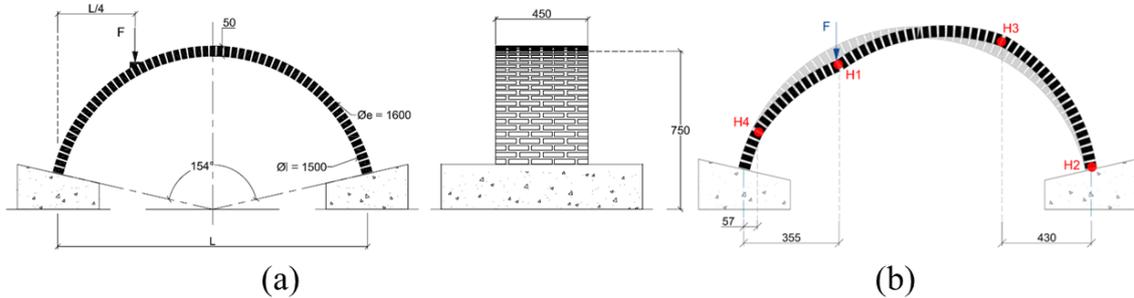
Unreinforced masonry arch (Basilio, 2007): (a) geometry (dimensions in mm) and (b) failure mechanism.
